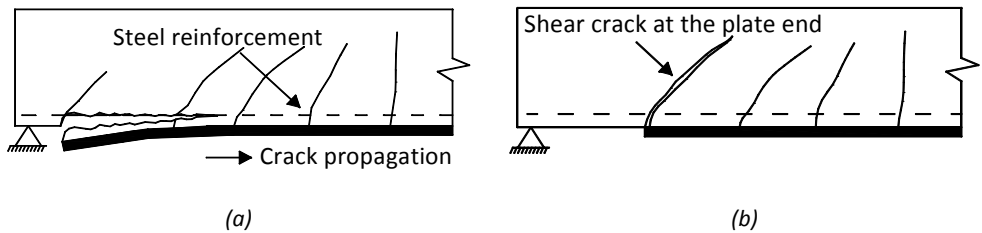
Concrete cover rip-off (a) and plate-end shear failure (b)
